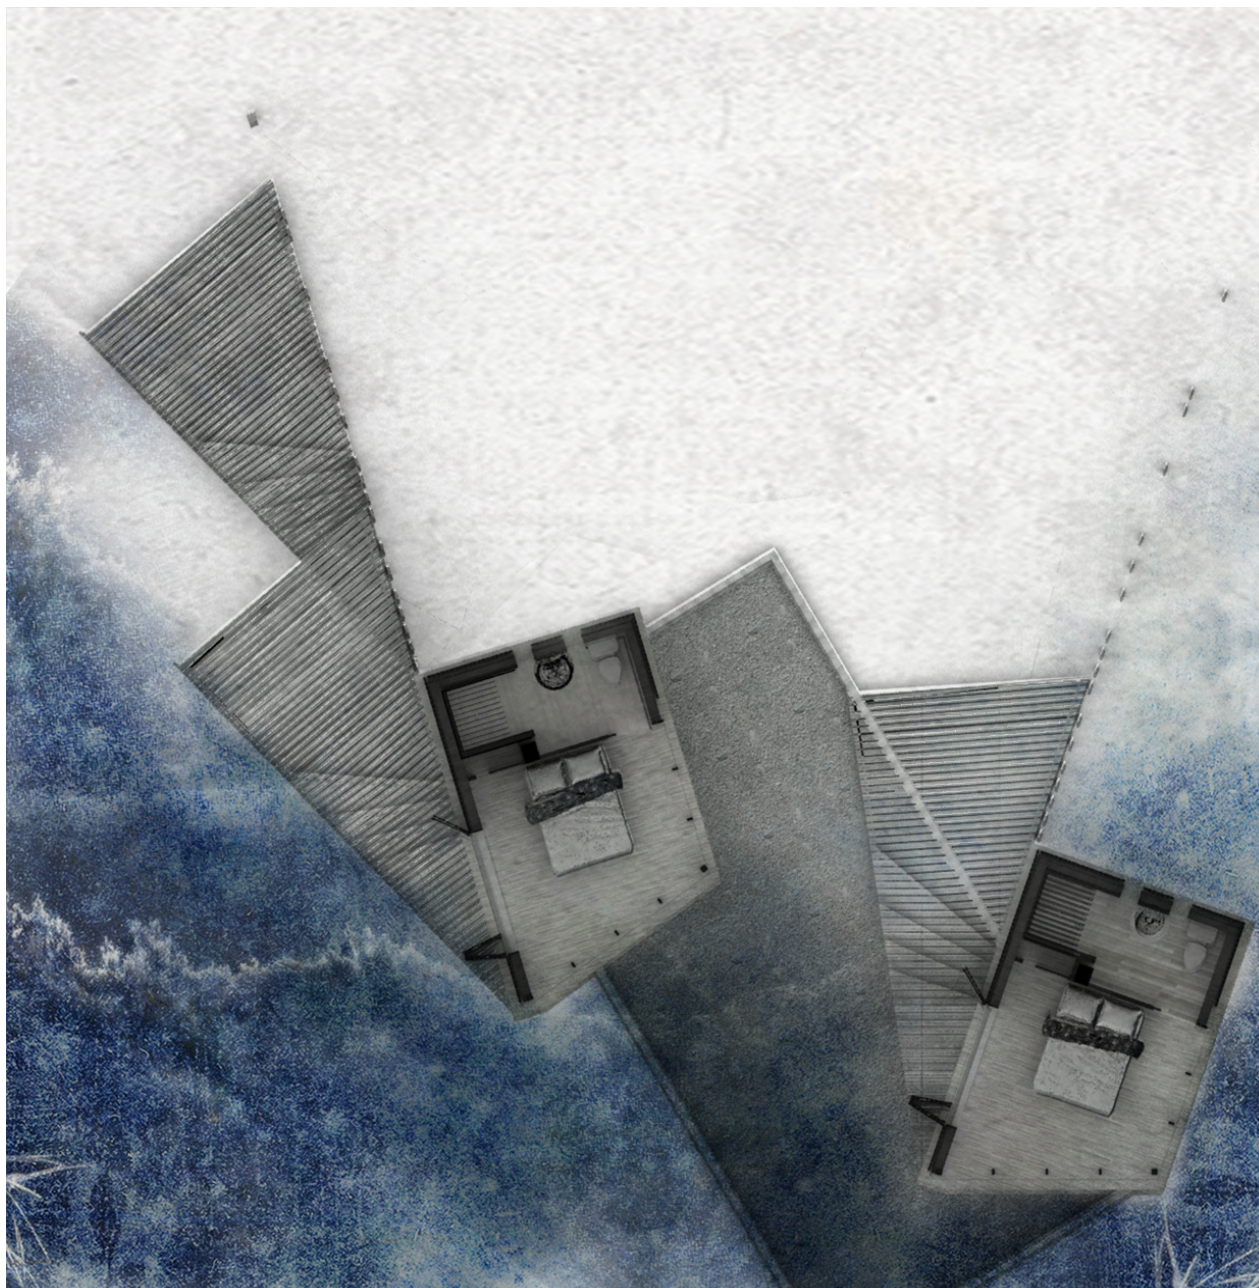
Floor plan of the bedroom units that sit over the carpenter's workshop. They all have the same floor plan and slightly different decking options. The self-contained units face back into the site to allow for internal reflection of the site. Image by author.
